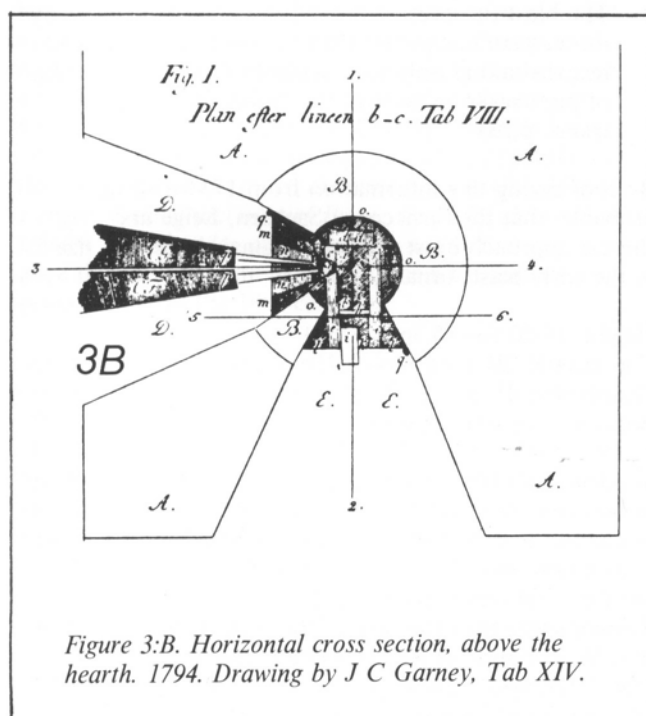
B. Horizontal cross section, above the hearth. 1794. Drawing by J C Garney, Tab XIV.
